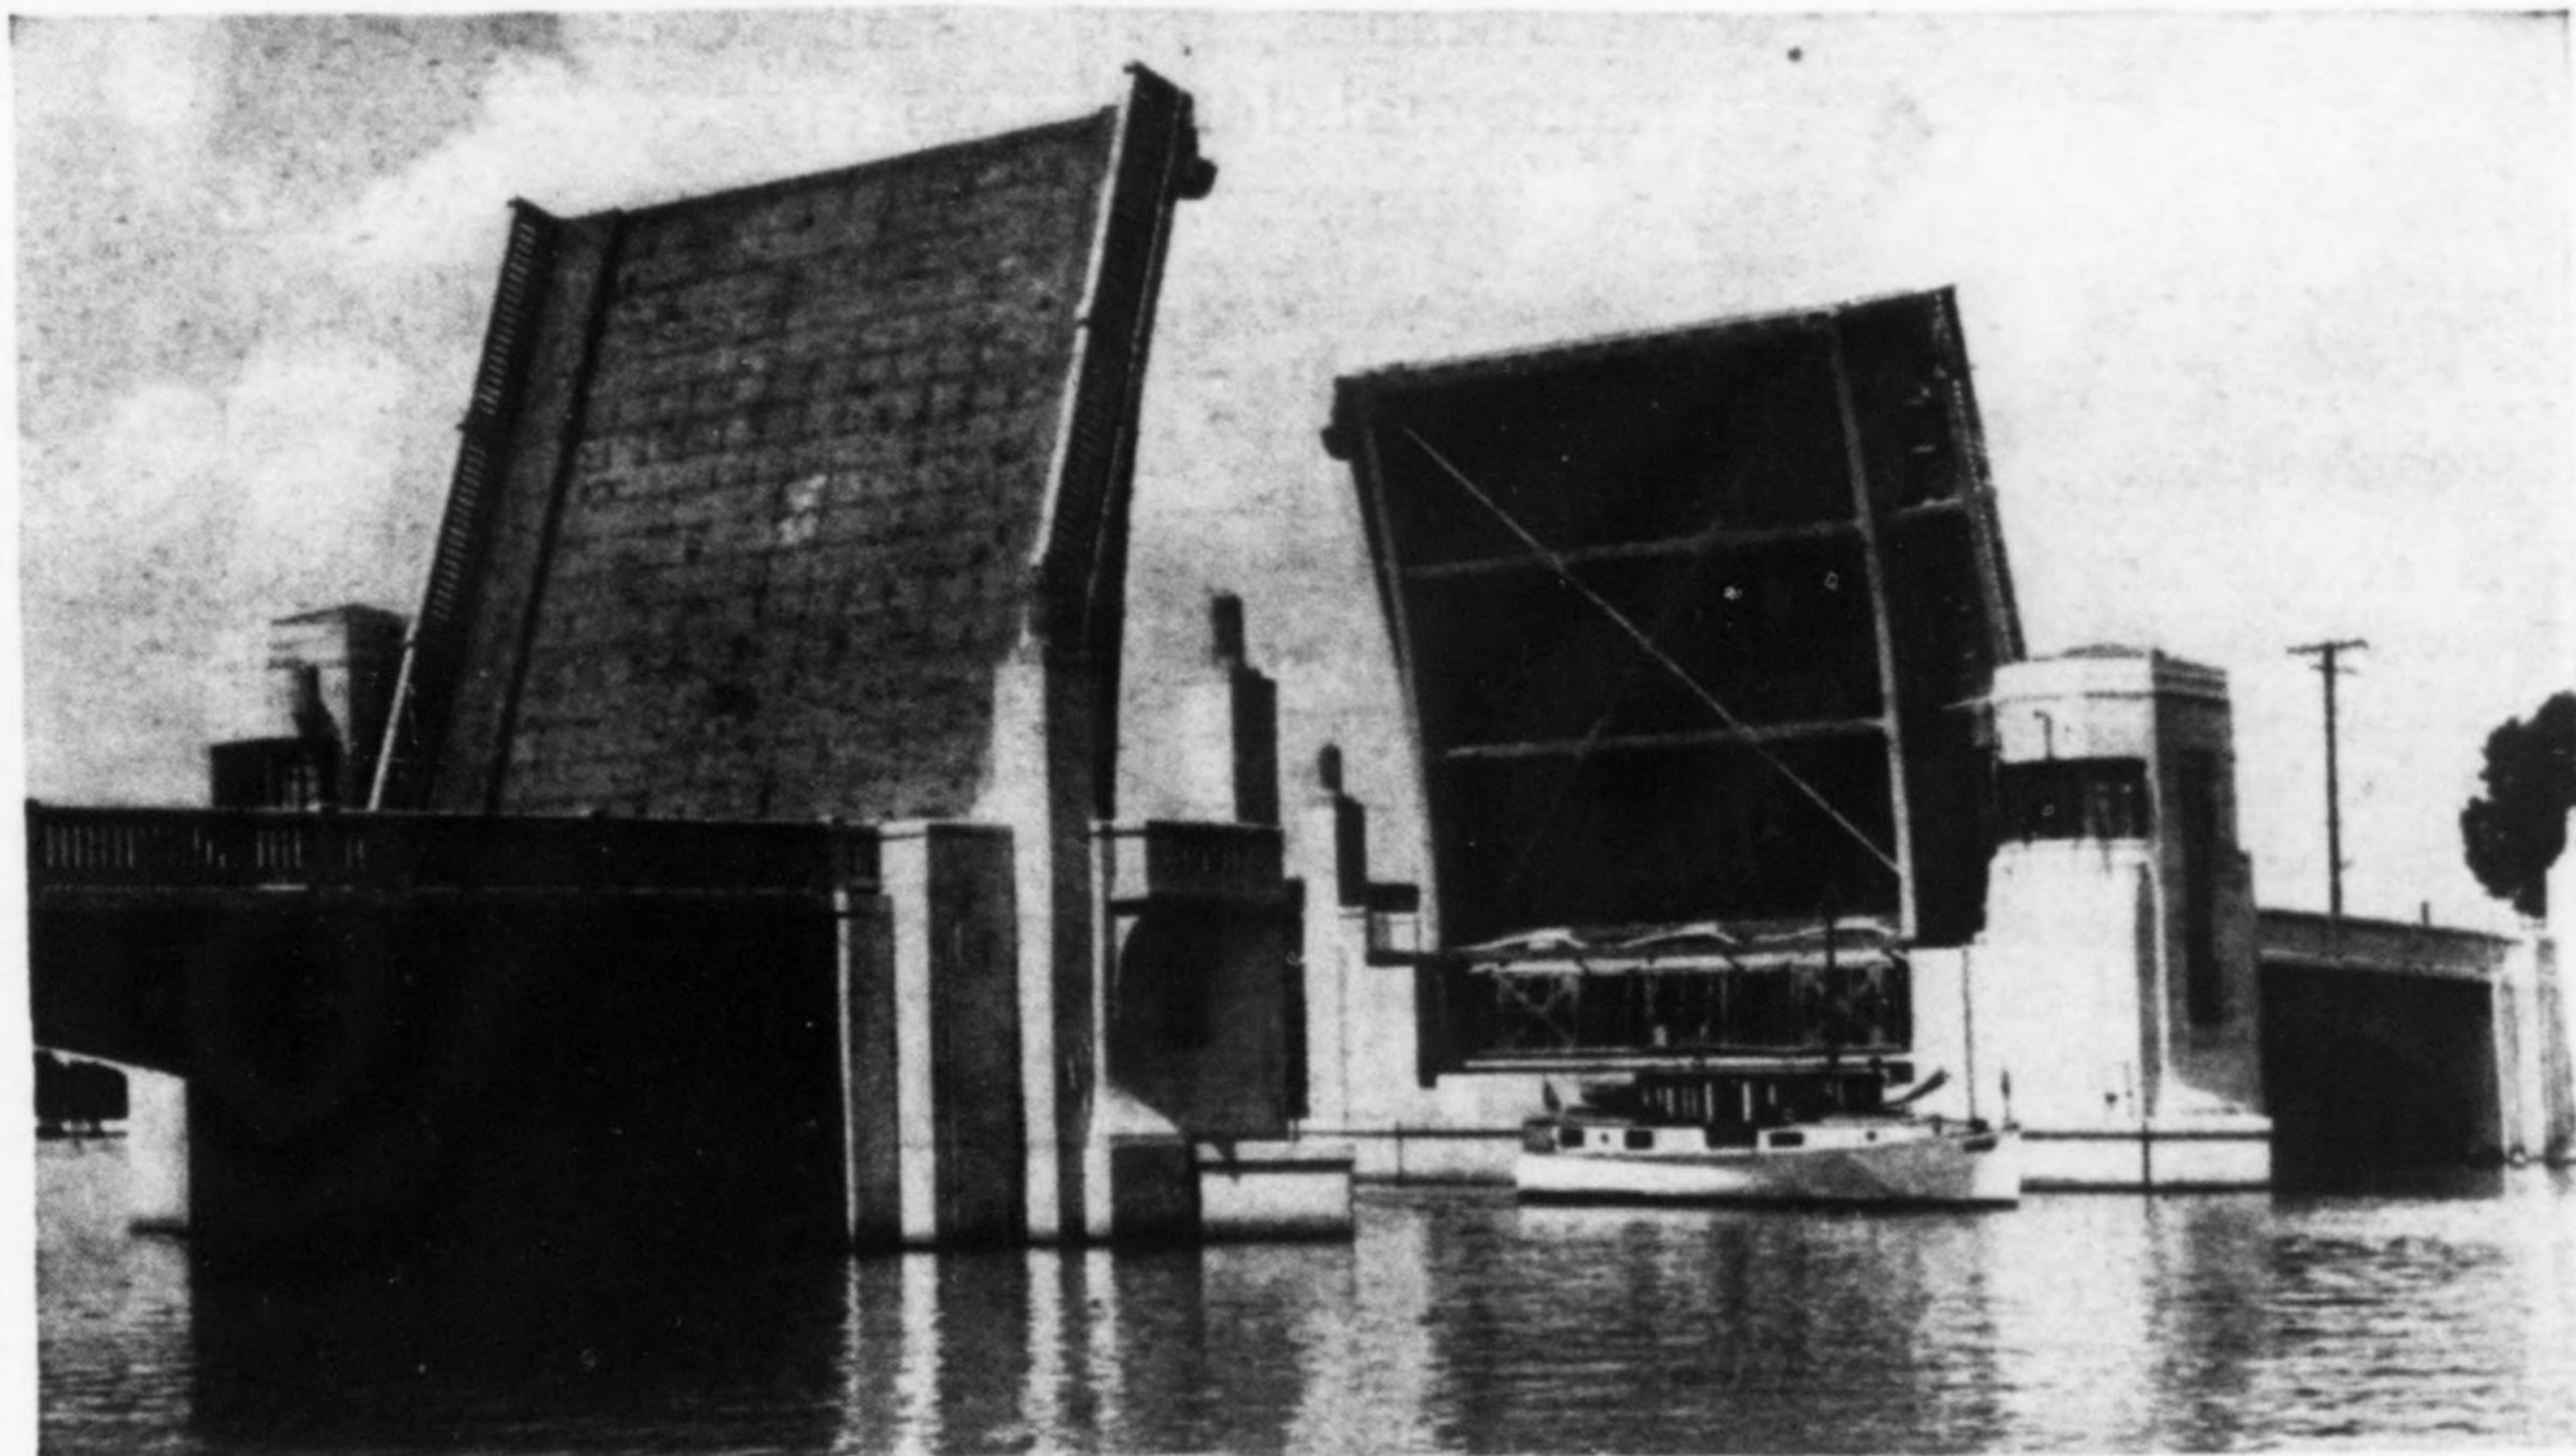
FLOOR, CURBS, SIDEWALKS AND RAILINGS of bascule leaves are made up of welded steel plates and shapes. Colored concrete panels are used on the piers and colored tile trim on the control and operator's houses. Note how pier fenders are separated from the piers. Also the glass front in the machinery room beneath the bascule leaf.
